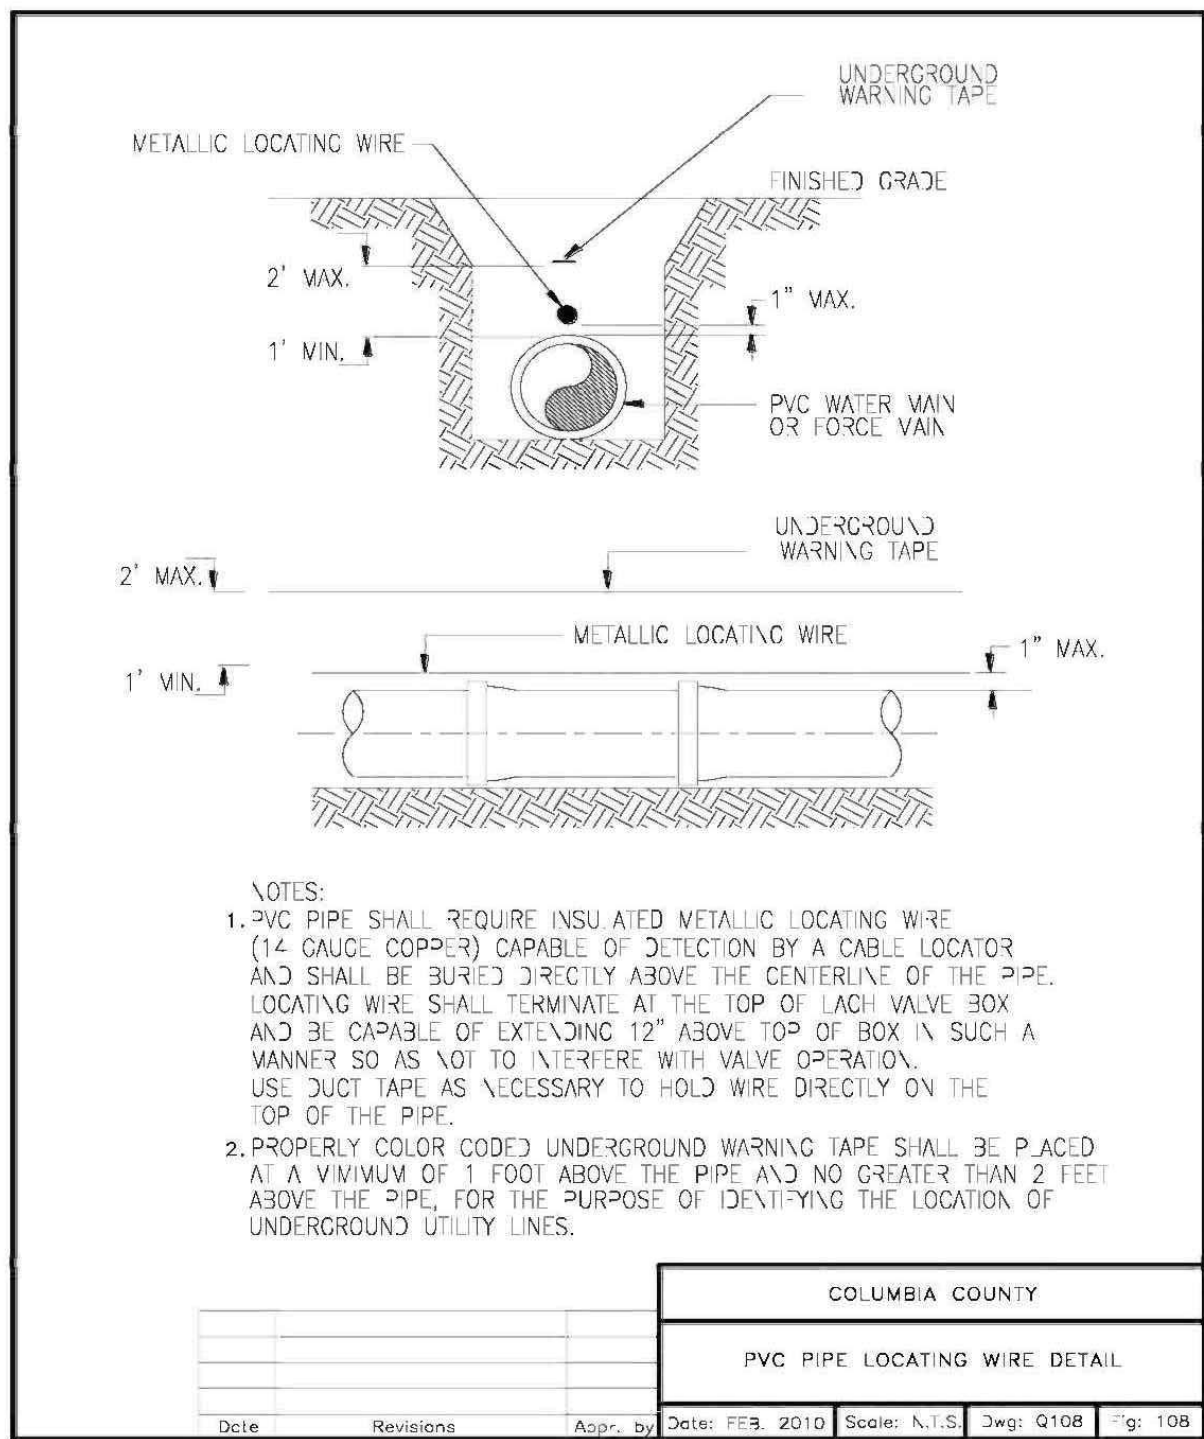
PVC PIPE LOCATING WIRE DETAIL
